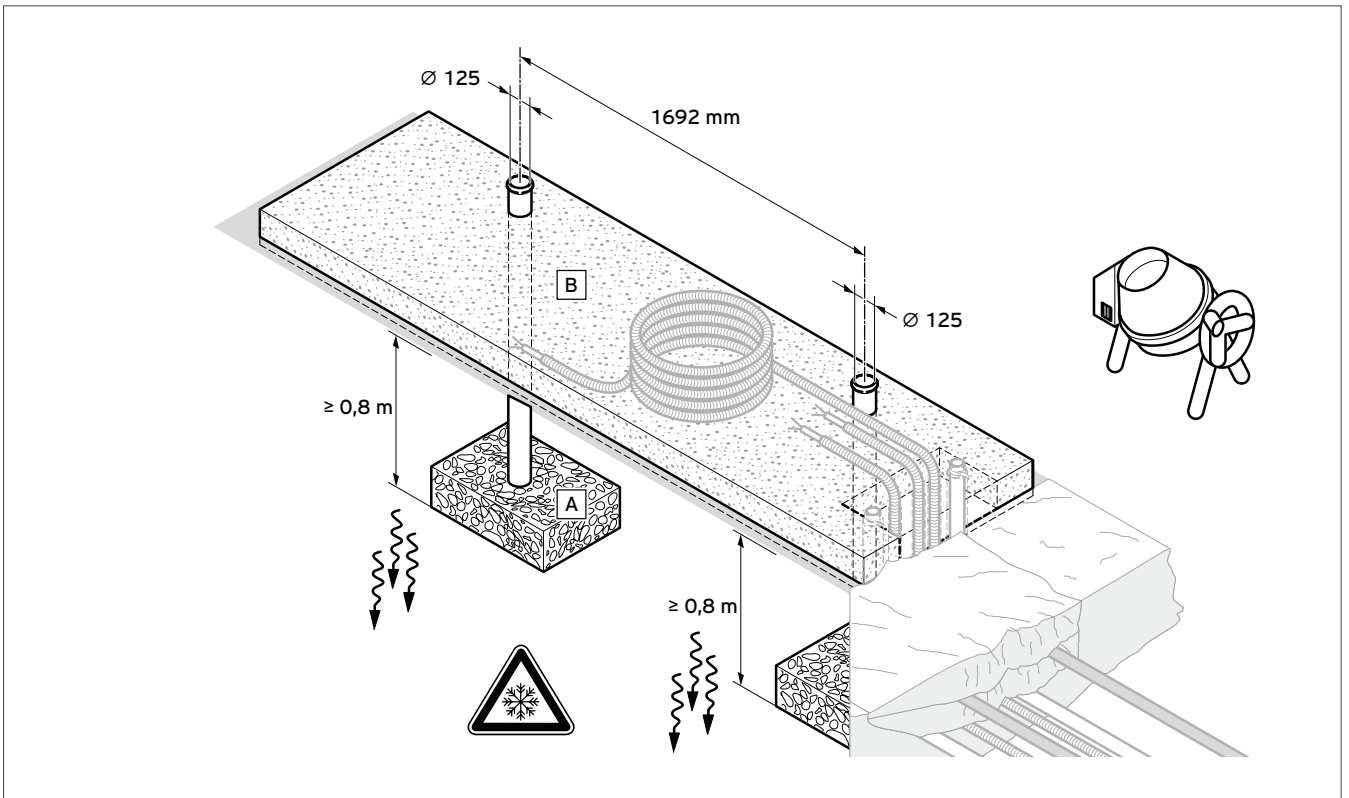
Foundation plan for two aroCOLLECT outdoor units
